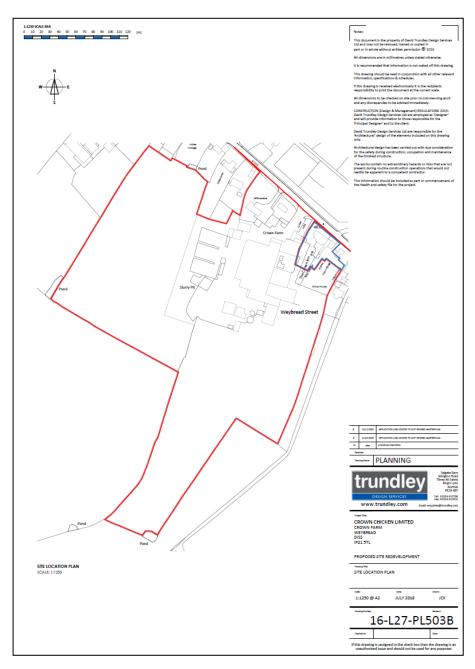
The Site Location Plan [Red Line Application Site plan] referred to in condition 3
